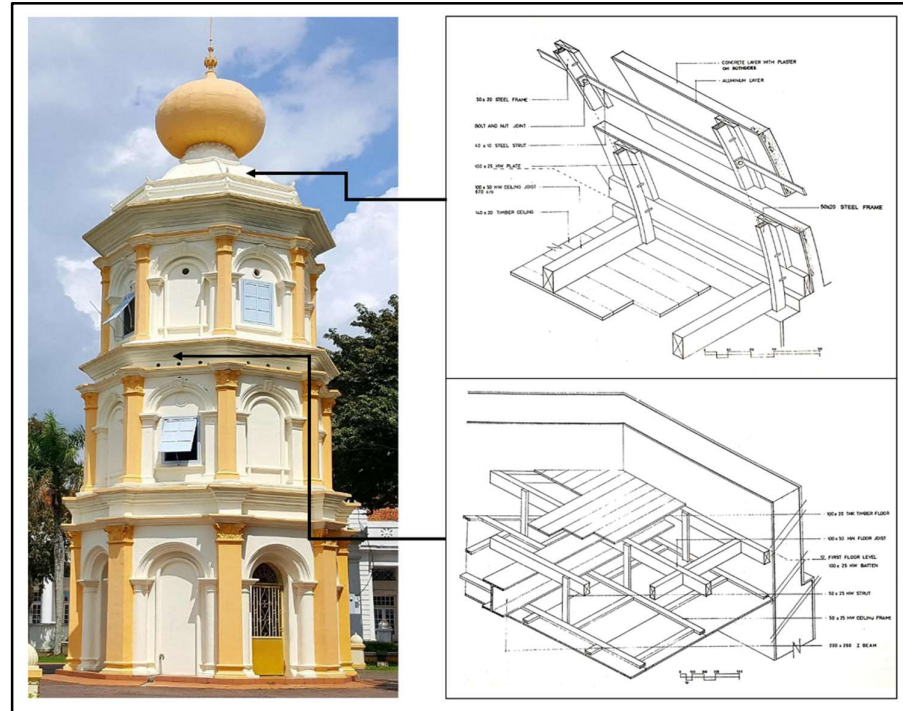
The construction technology of Balai Nobat in Alor Setar, Kedah (1917), during the British colonial era. Top-right: The dome is constructed of timber, concrete, and steel frame. Below-right: The floor system by various steel beams and timber on a masonry wall. Adapted from National Heritage Trust (1998).
